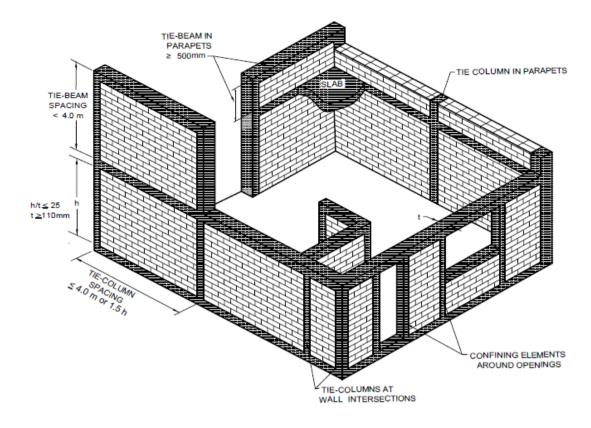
REQUIREMENTS REGARDING CONFINING ELEMENTS
